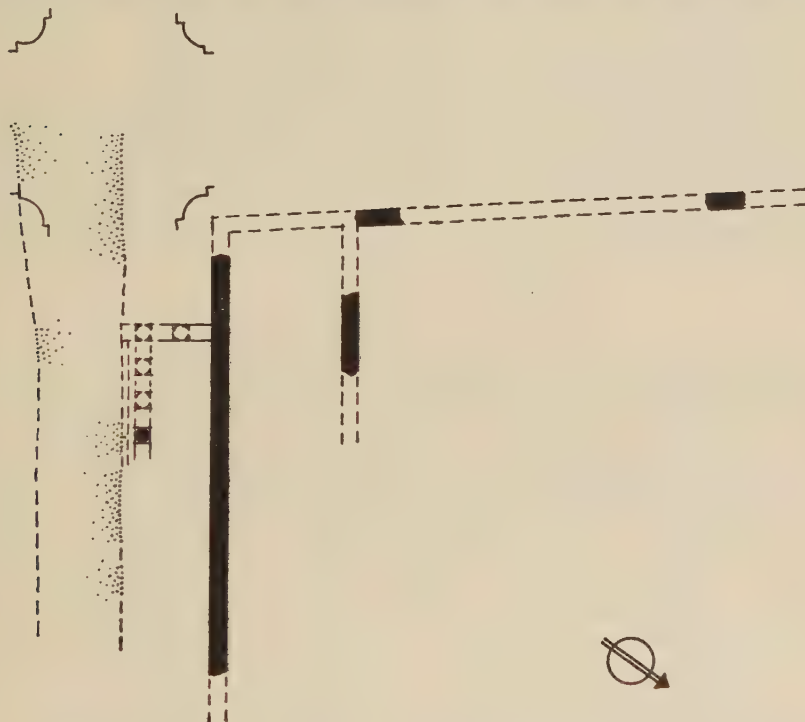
REMAINS OF THE FIRST ROMAN ROAD AND THE EARLIEST ROMAN BUILDING WHICH HAVE BEEN UNCOVERED UNDER THE CHURCH OF ST. MARTIN AT ANGERS
